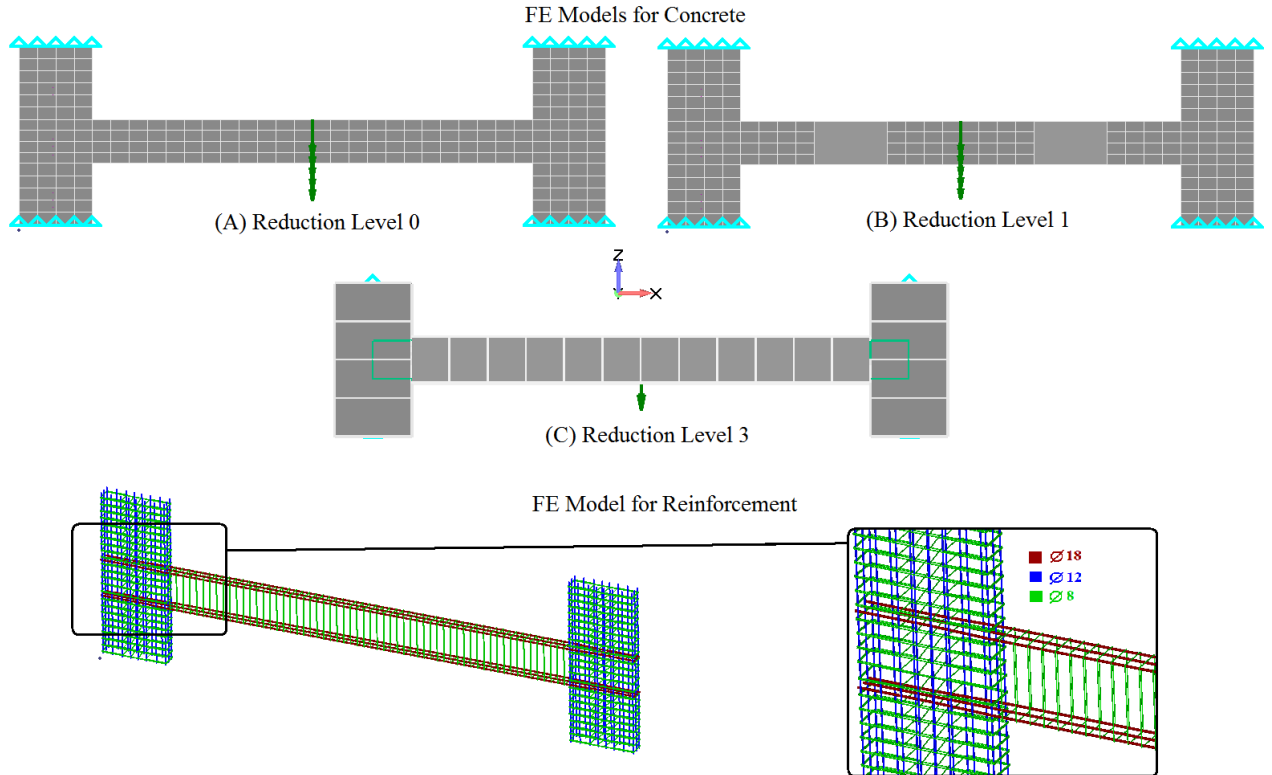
RC BEAM SUPPORTED ON TWO SHEAR WALLS. FE MODELS OF CONCRETE AND REINFORCEMENT.
